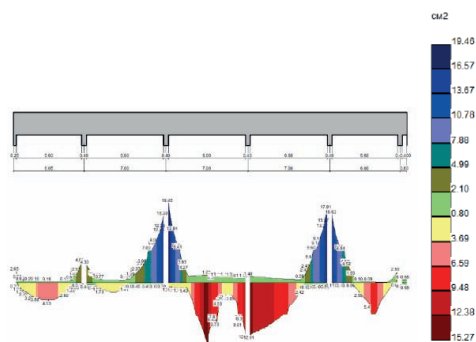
Required reinforcement in beams 40x80 mm (diagram)
